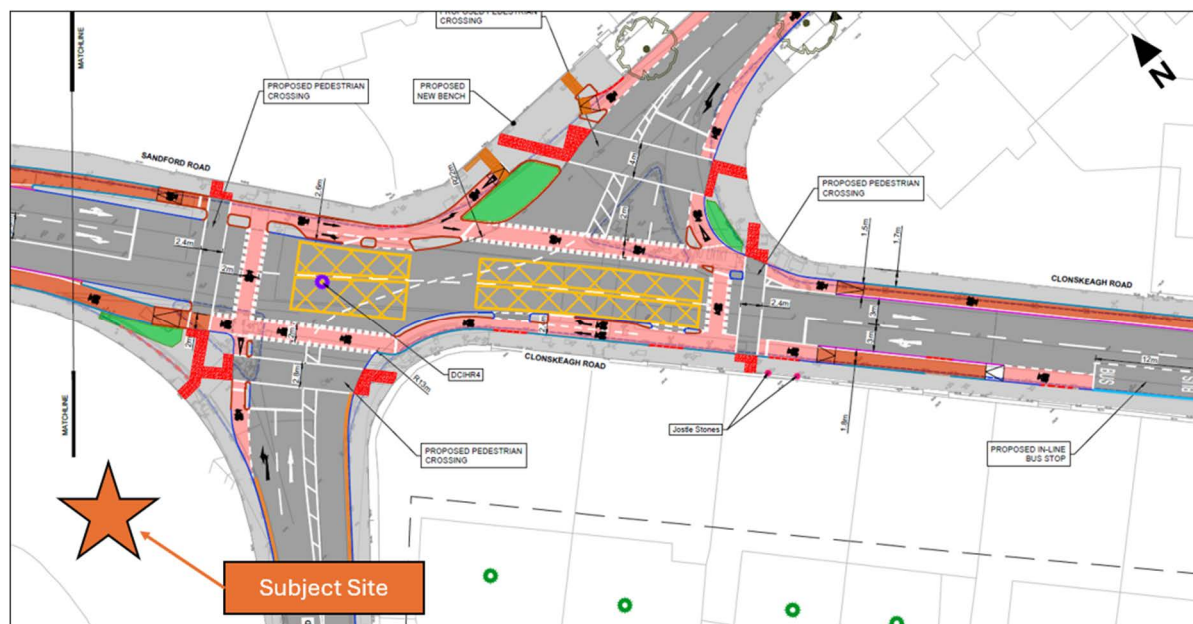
Walking & Cycling Scheme Layout at Sandford Road (Source: DCC)
